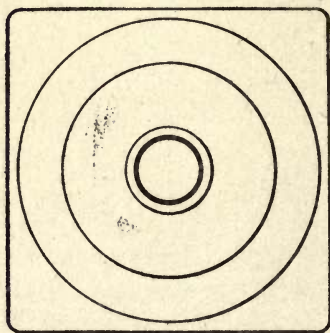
Prof. Lilley's Method of Testing Hollow Struts.
